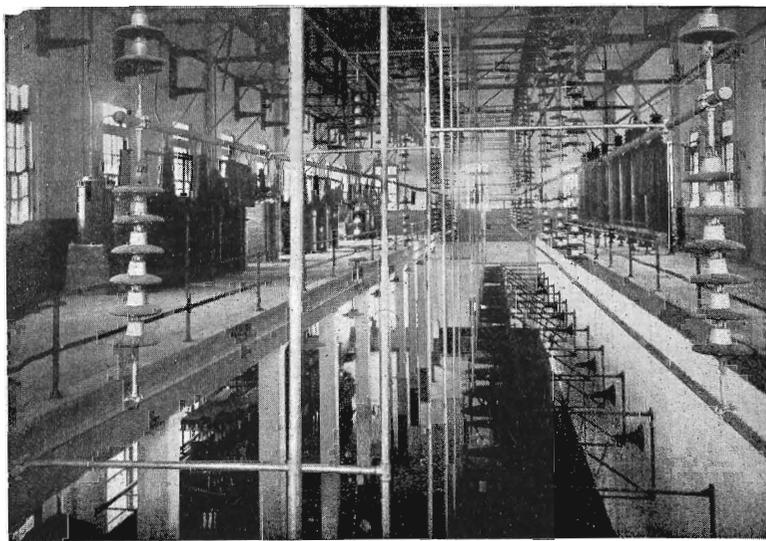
Butte Substation, Showing 100,000-volt Bus Construction, Great Falls Power Company
